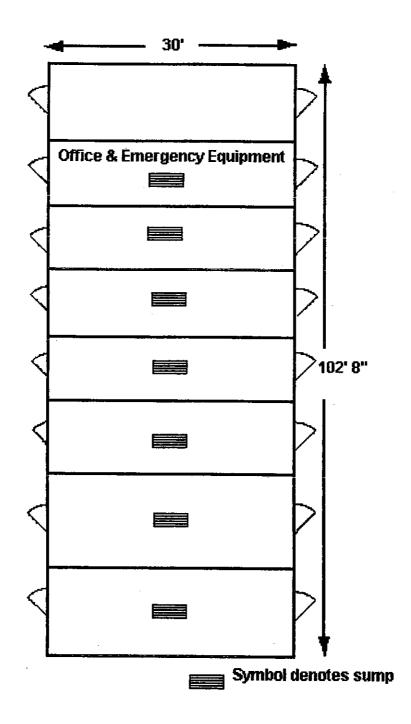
Chemical Waste Storage Facility, Building 7653.
